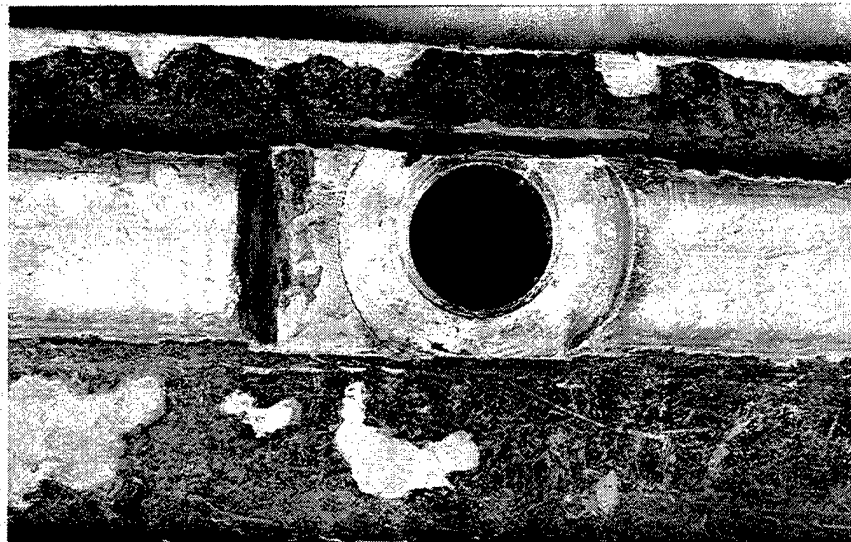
An example of a counterbored bolt hole made on top of the AVL B extruded aluminum deck panel. Note that counterboring had cut into the protruded tread on the right, leaving a sharp fillet at the bottom of the counterbored hole. The fillet can act as a stress raiser for the crack initiation.
